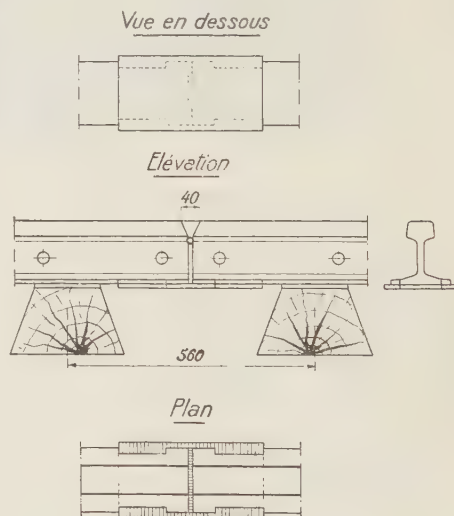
Welded joint. (*Jugoslav State.*)
